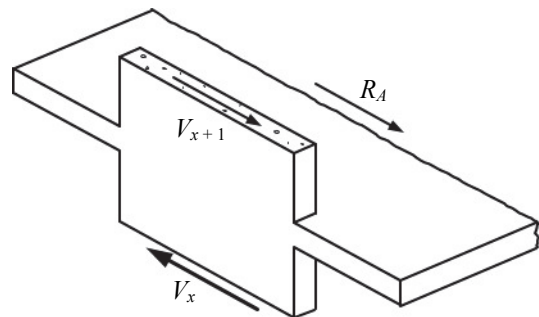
Force R_A transferred between diaphragm and wall can be obtained by section cuts through wall.
